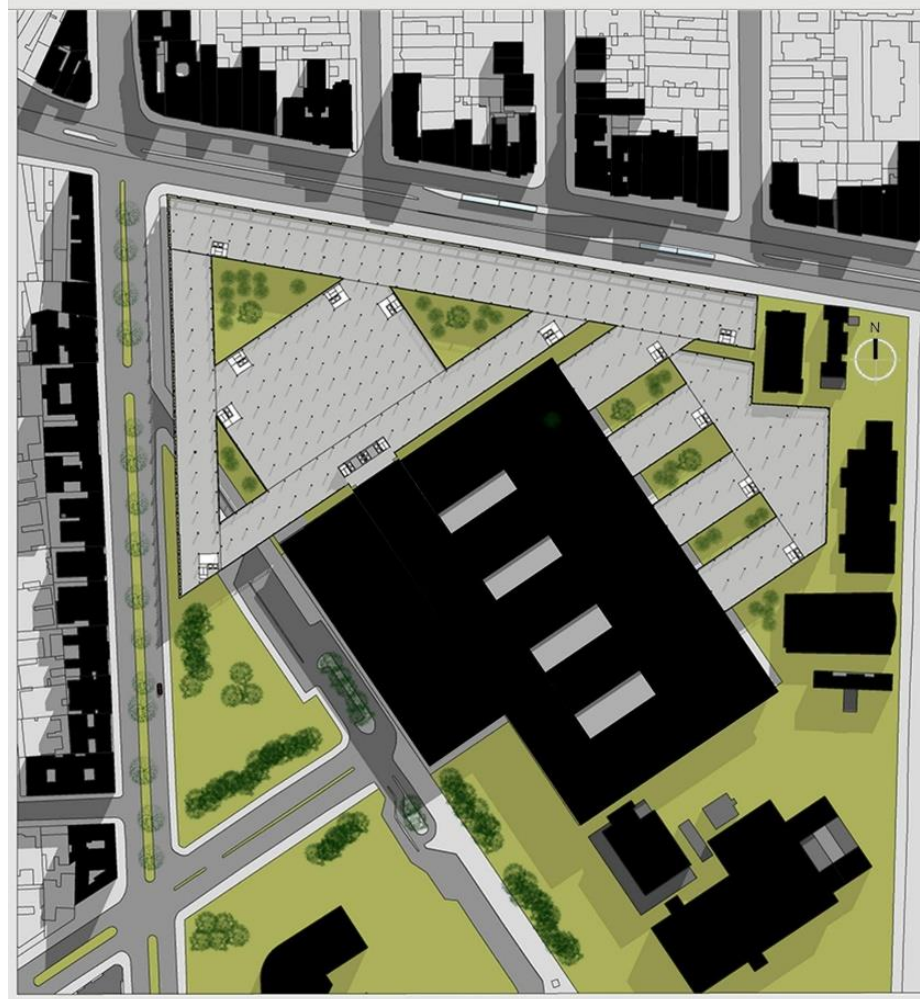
HCPA, counter-project. Typical floor plan. Source: The author, 2020.
